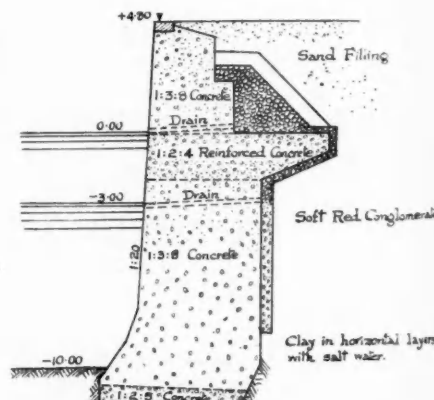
Cross section of the reconstructed dock wall at the Port of La Plata.
